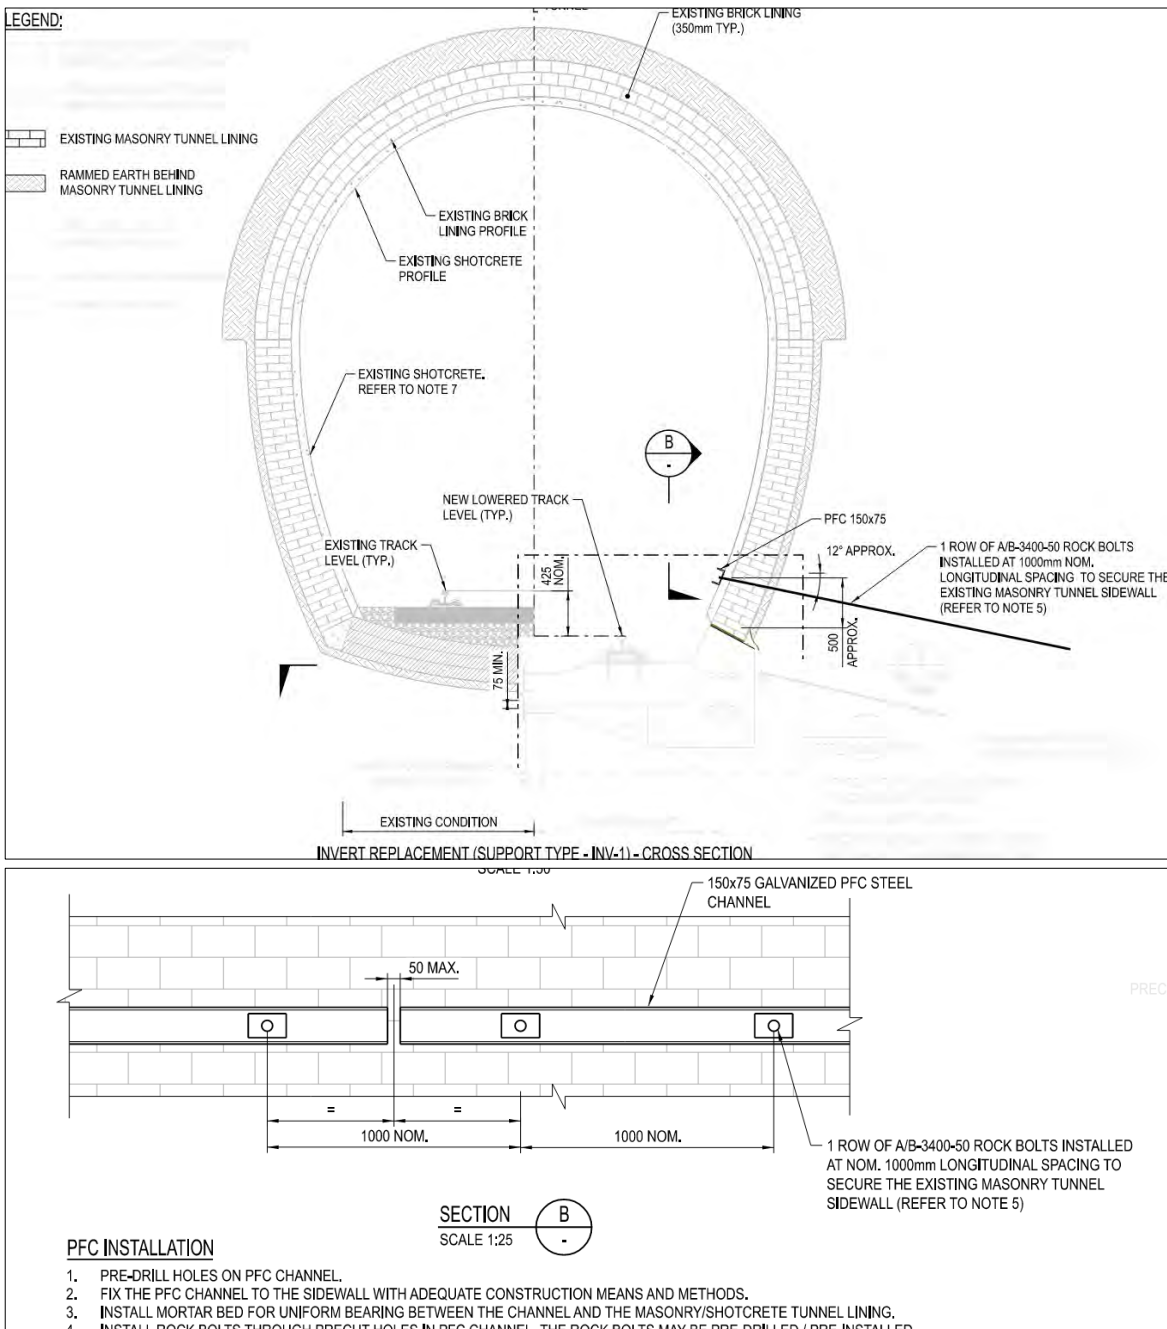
TYPE INV-1 CROSS SECTION OF TUNNEL (TOP) AND ELEVATION (BOTTOM) DETAILS SHOWING PFC INSTALLATION AND ROCK BOLT SUPPORT TO TUNNEL LINING. (SOURCE: AURECON/VLINE)
